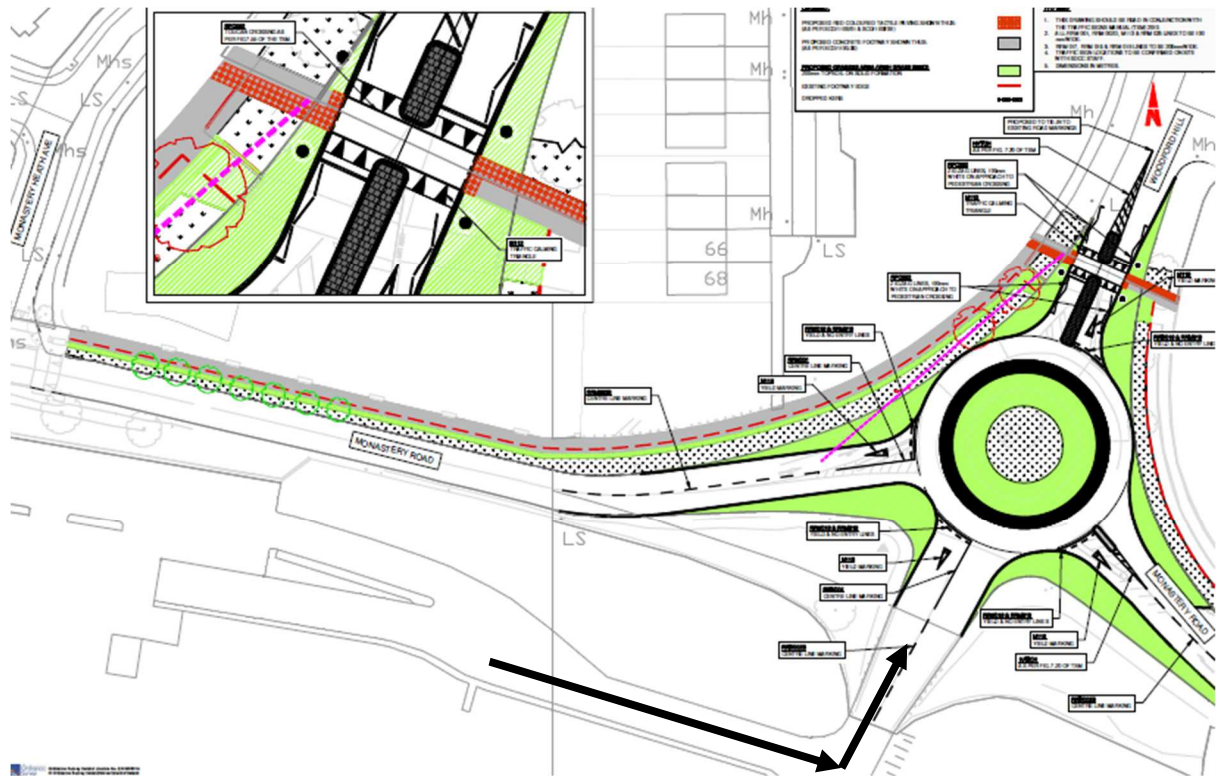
Site access onto the Monastery Road / Woodford Hill Roundabout
